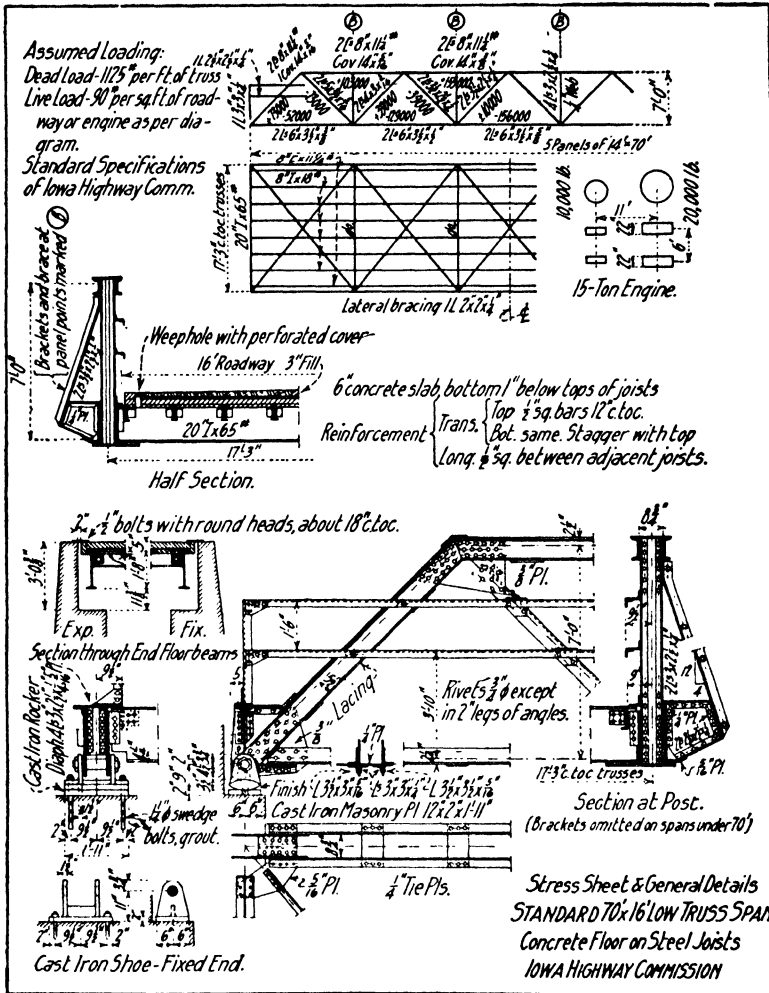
LOW TRUSS SPAN WITH STRINGERS.
